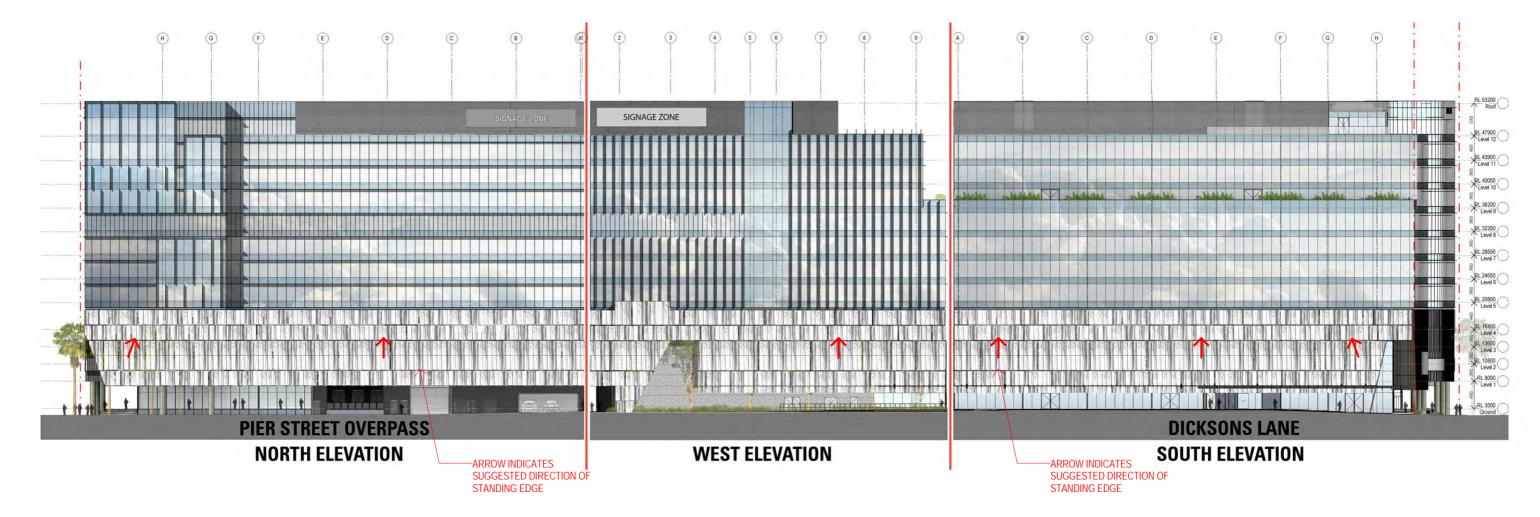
Section 96 NW Plot Proposed Unwrapped North, West and South Elevation
